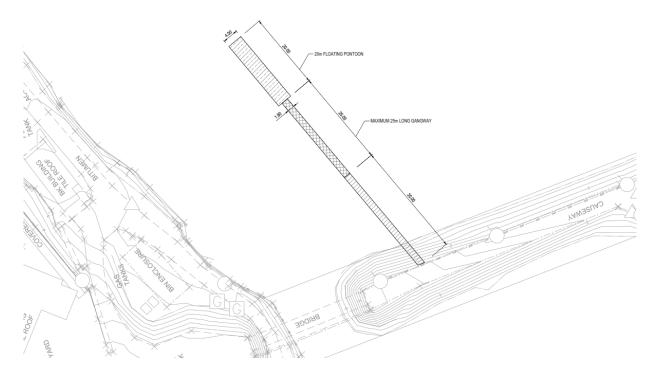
Diagram showing the location of the proposed jetty of the causeway. Source: Petherbridge & Co.
